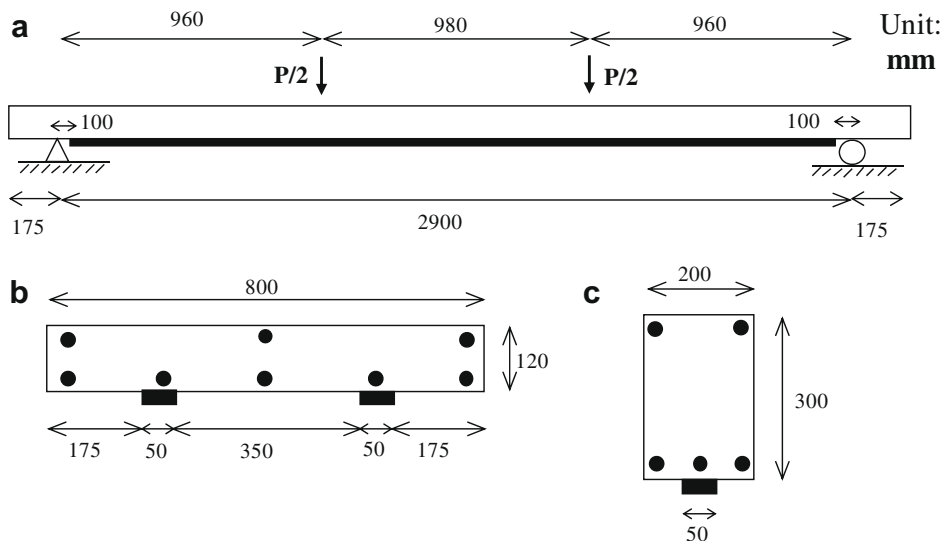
Geometric properties of the specimens tested in [18]: (a) shear span and loading condition for both slab and beam specimens, (b) cross-section geometry of the slab specimens, and (c) cross-section geometry of the beam specimens.
